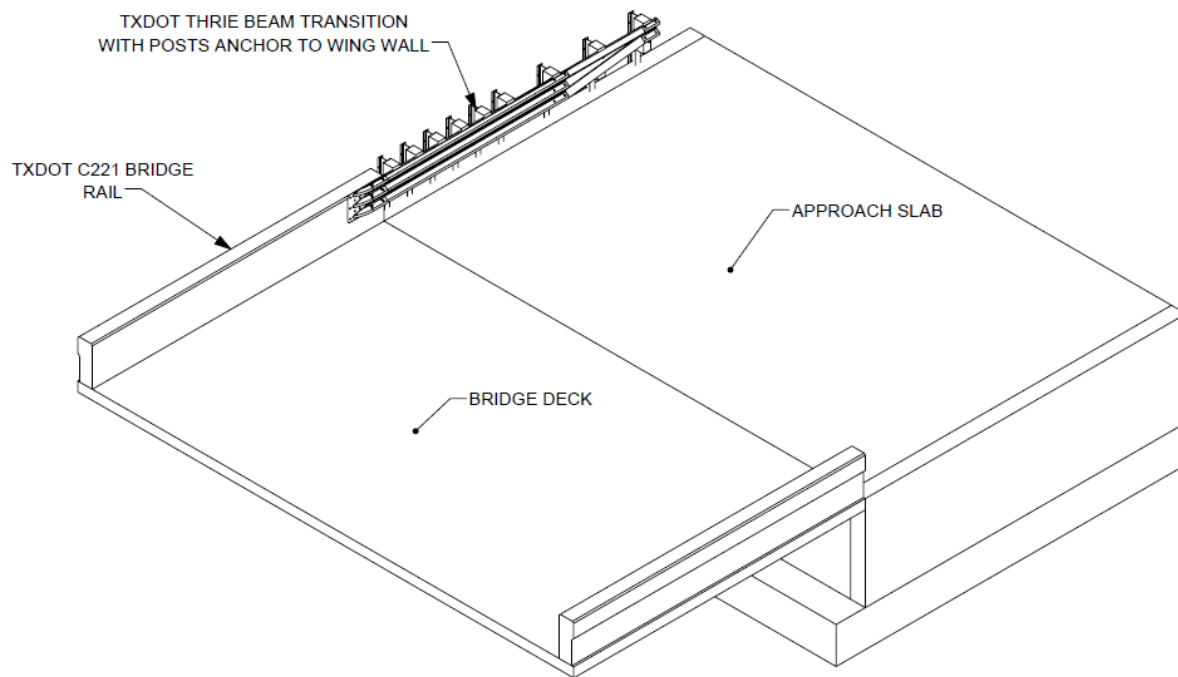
TxDOT Transition Anchored on Top of 12-Inch Wide Wing Wall.
